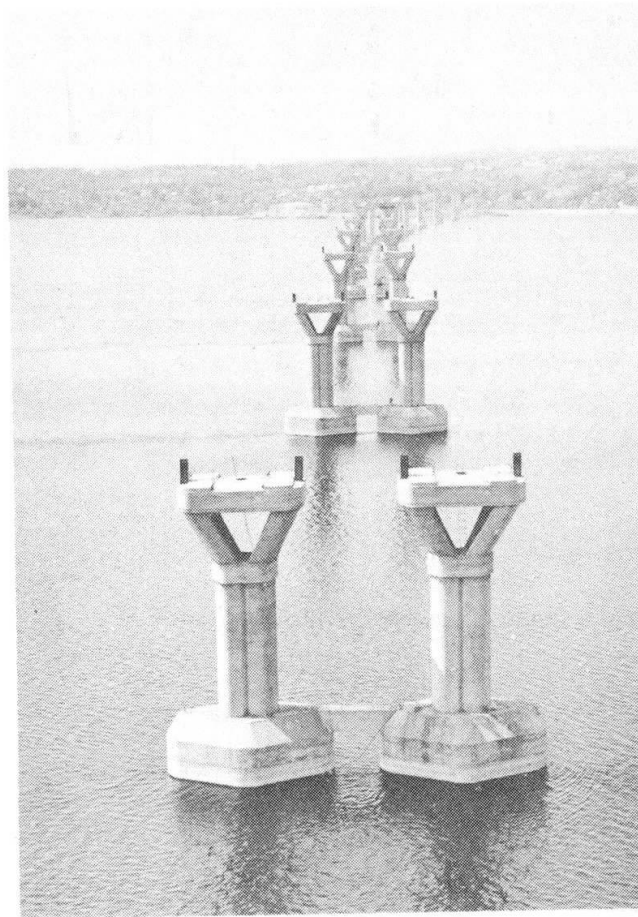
View of constructed piers for the bridge over the Volga river near Saratov
